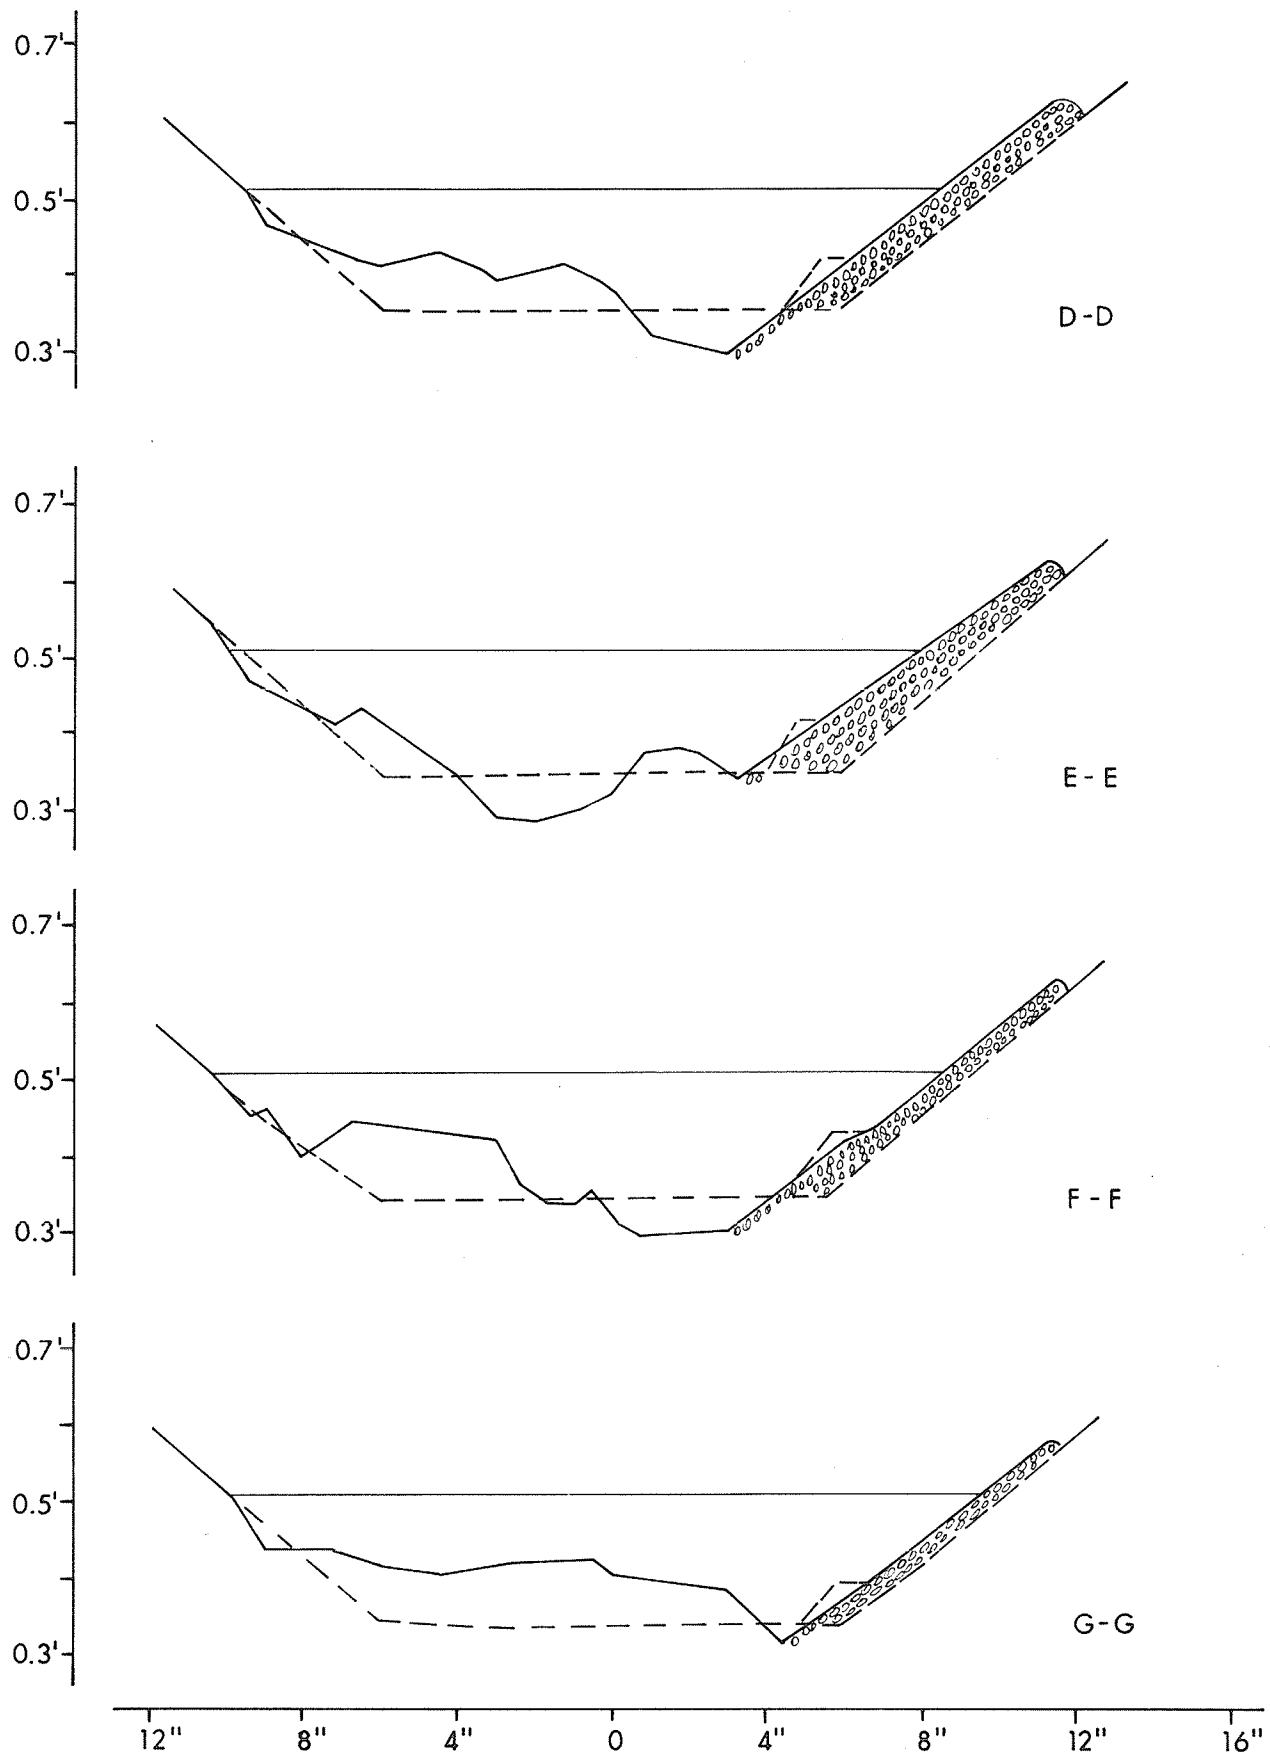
CROSS - SECTIONS FOR TEST No. 6 .
